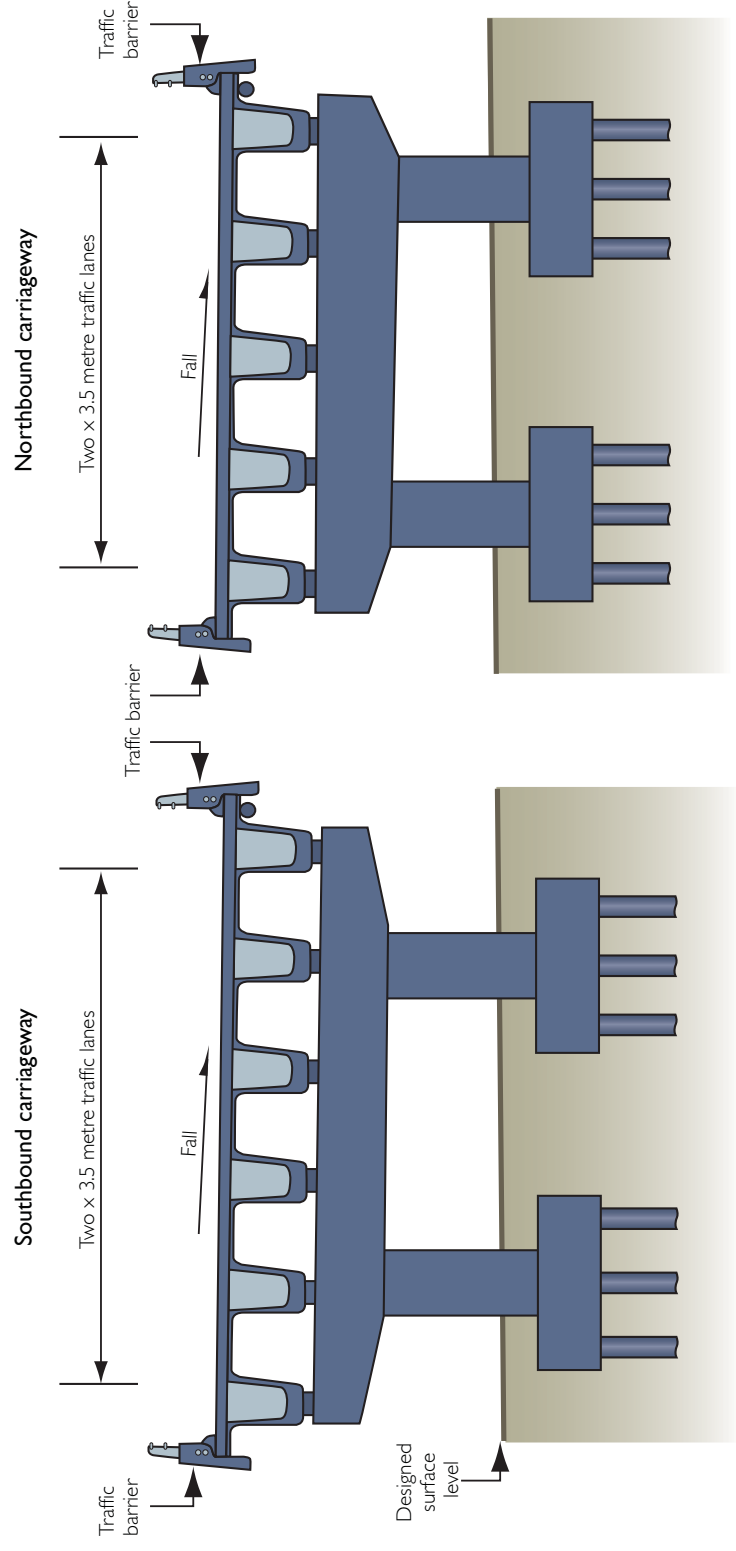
Indicative cross-section – Ten Mile Creek and Culcairn Road bridges
